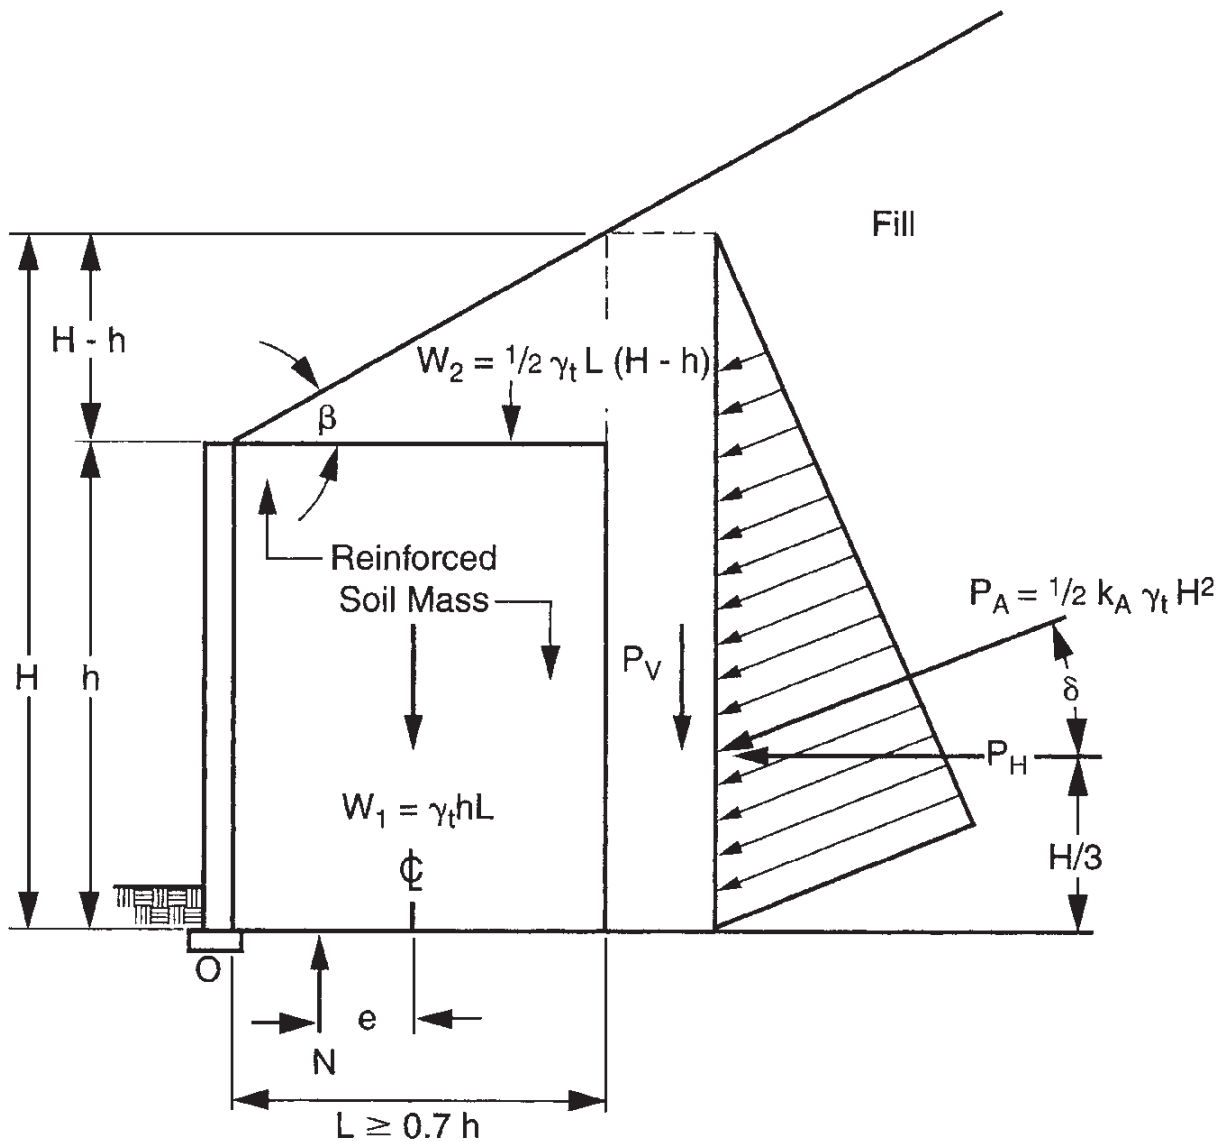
Static design analysis for mechanically stabilized earth retaining wall having sloping backfill. (Adapted from *Standard Specifications for Highway Bridges*, AASHTO 1996.)
